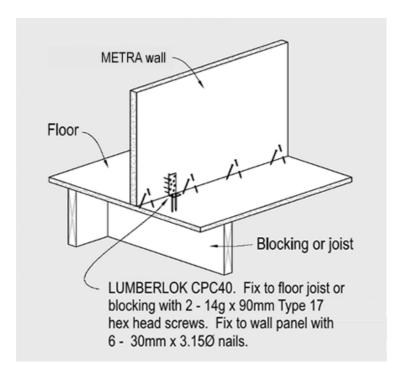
Internal Wall 6kN Tie Down Details for Additional Bracing – Timber Floor (refer bracing type LP10)
